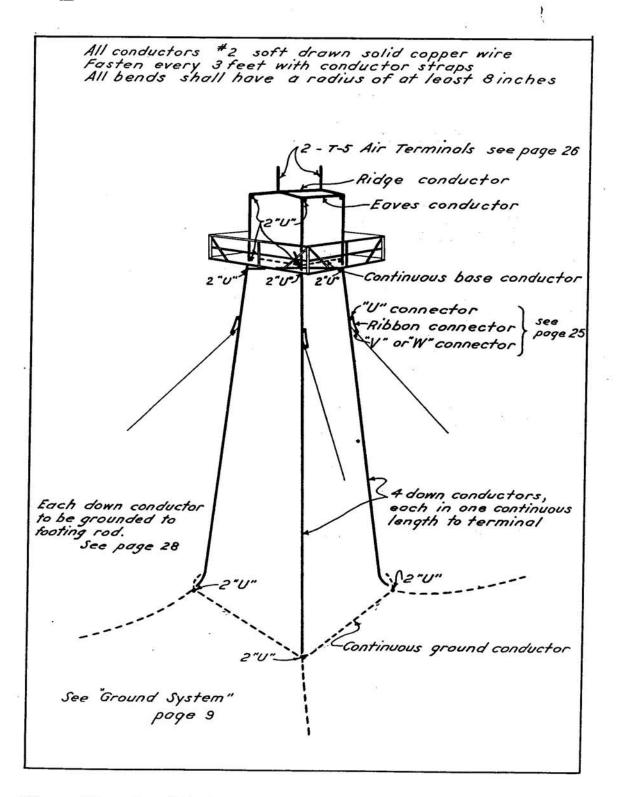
Guyed timber tower with 7- by 7-foot or flat-roofed cab.
